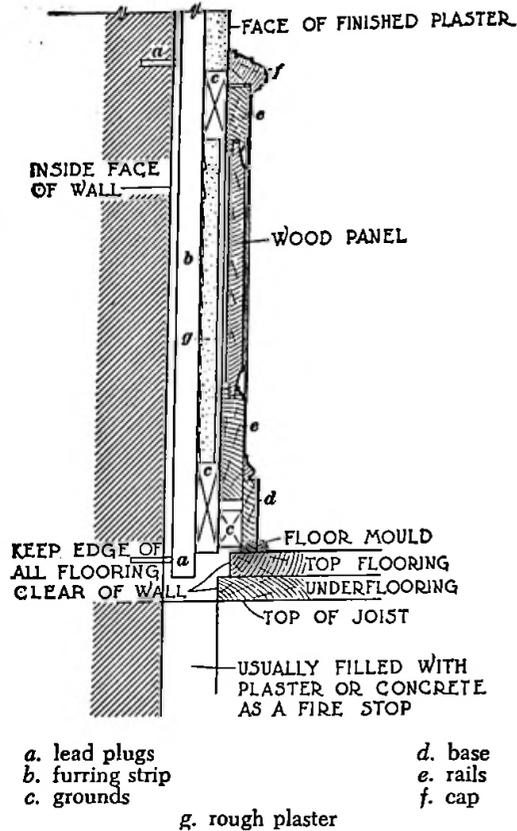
CROSS SECTION THROUGH WOOD PANELING
